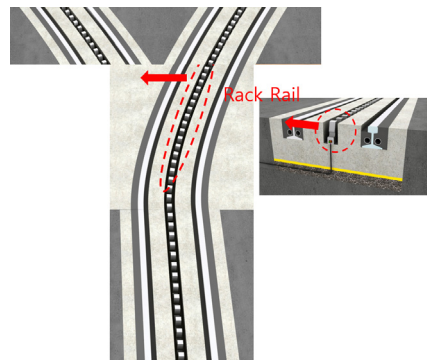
Interruption to movement of rack rail in embedded concrete rack track
